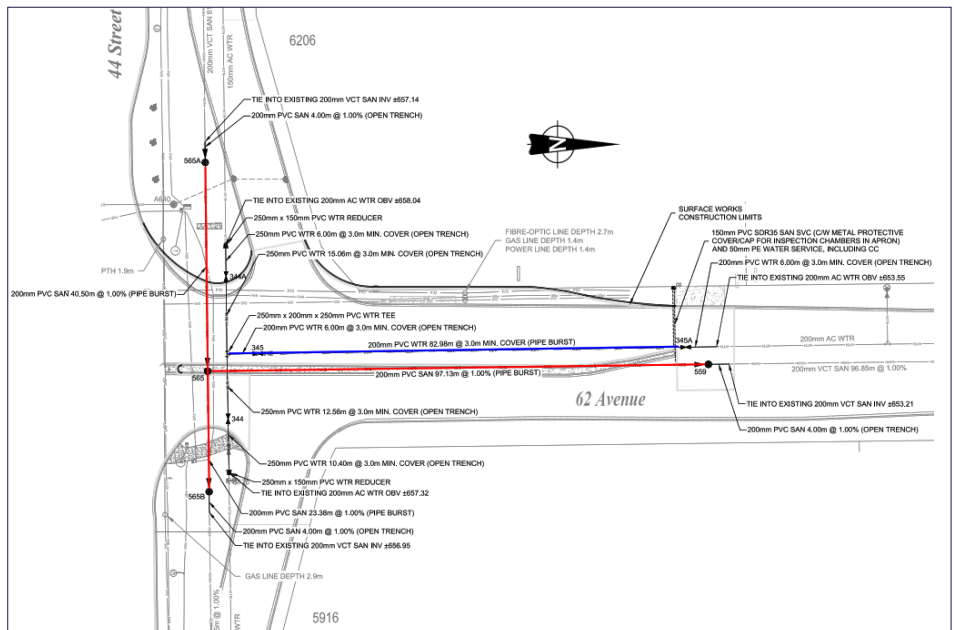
Plan View of Pipe Bursting Installations – 44<sup>th</sup> Street and 62<sup>nd</sup> Avenue
